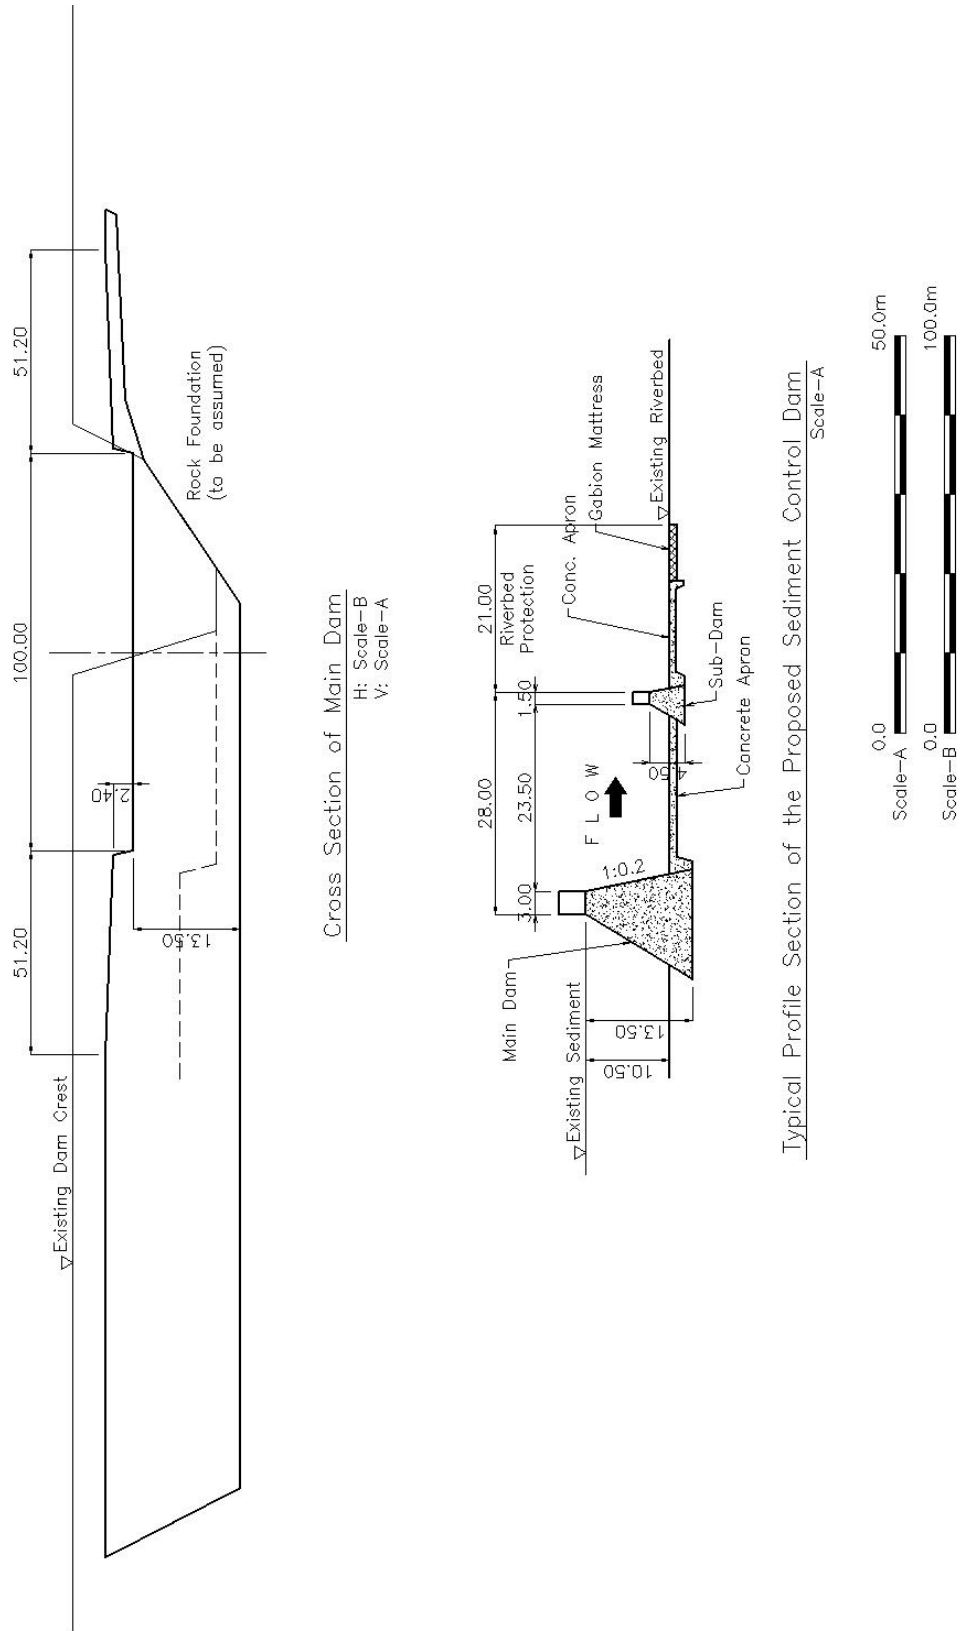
Typical Section of Proposed Sediment Control Dam
